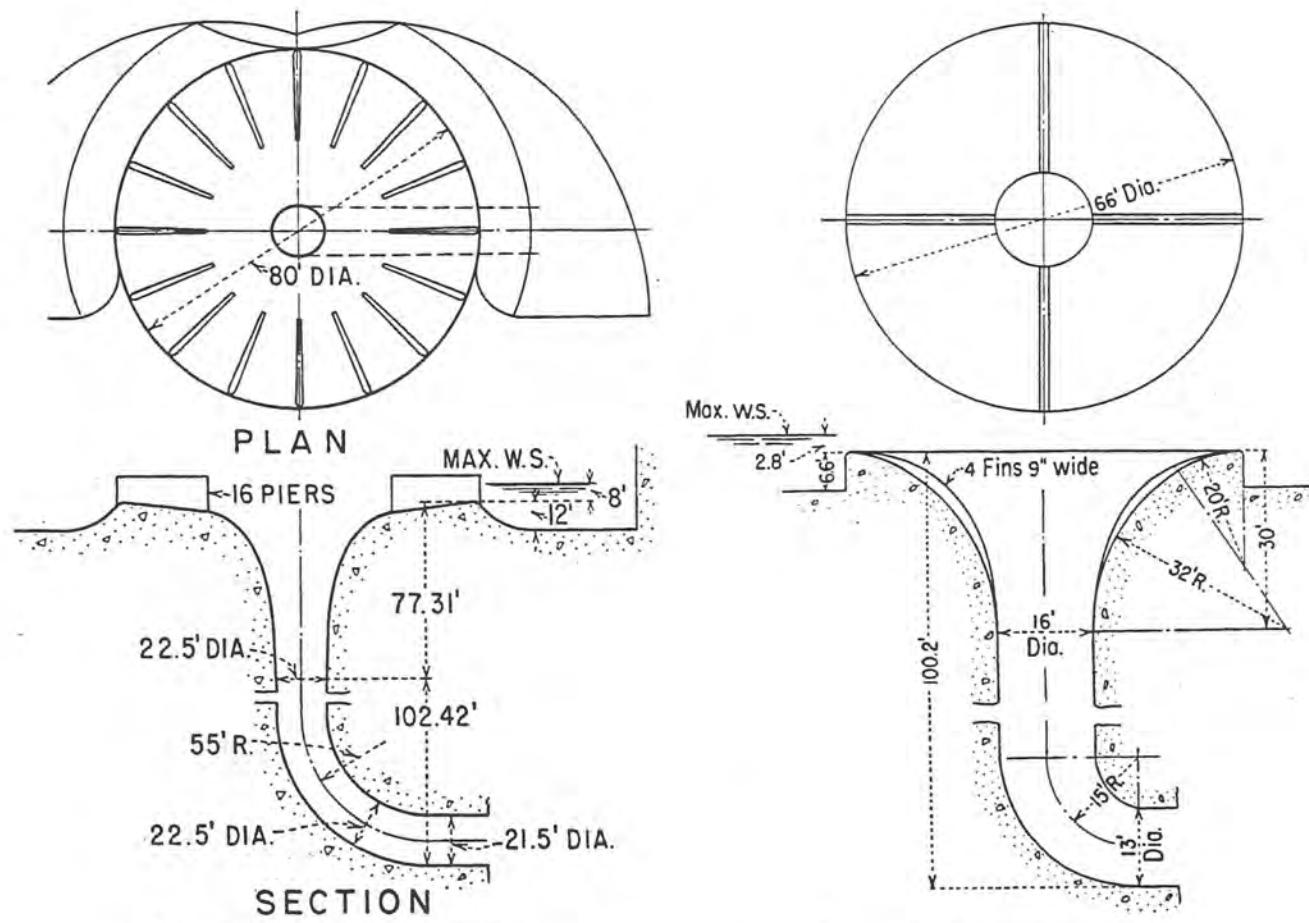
DAVIS BRIDGE DAM SPILLWAY
